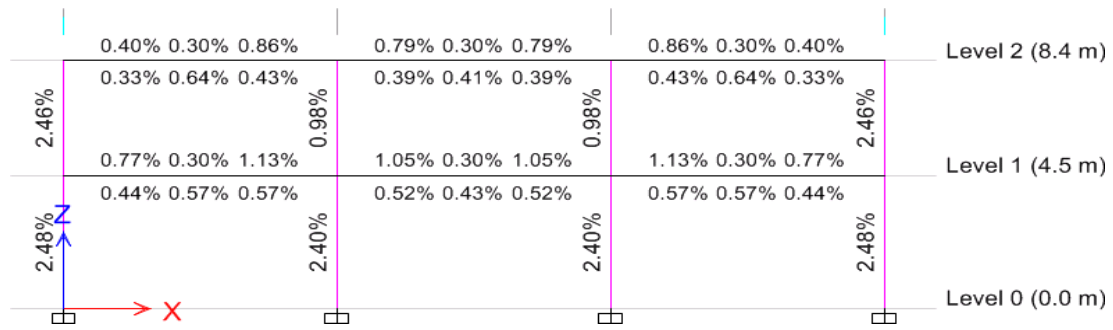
Required longitudinal reinforcement for building ID 2219
